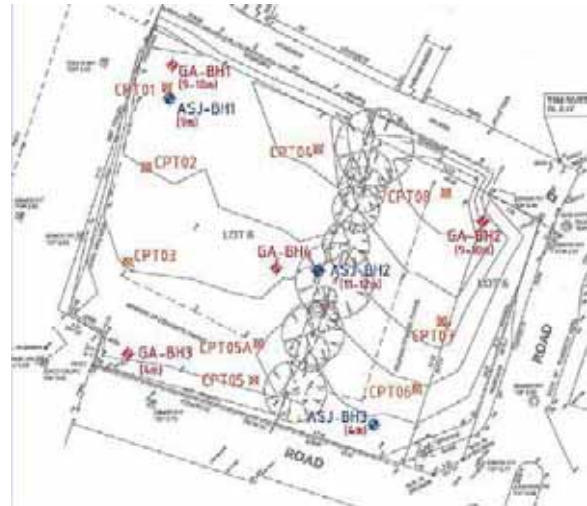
Site investigation layout – red figures indicate depth to top of stiff clay
